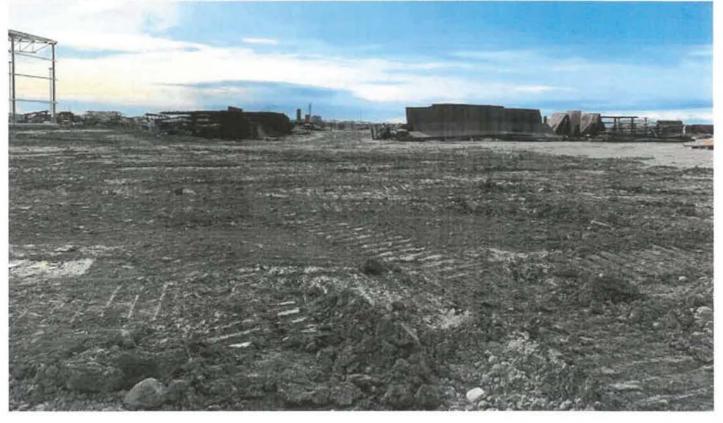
View of proposed Building Site towards East. Building C under construction in background Steel storage visible. (Oct 2019).
